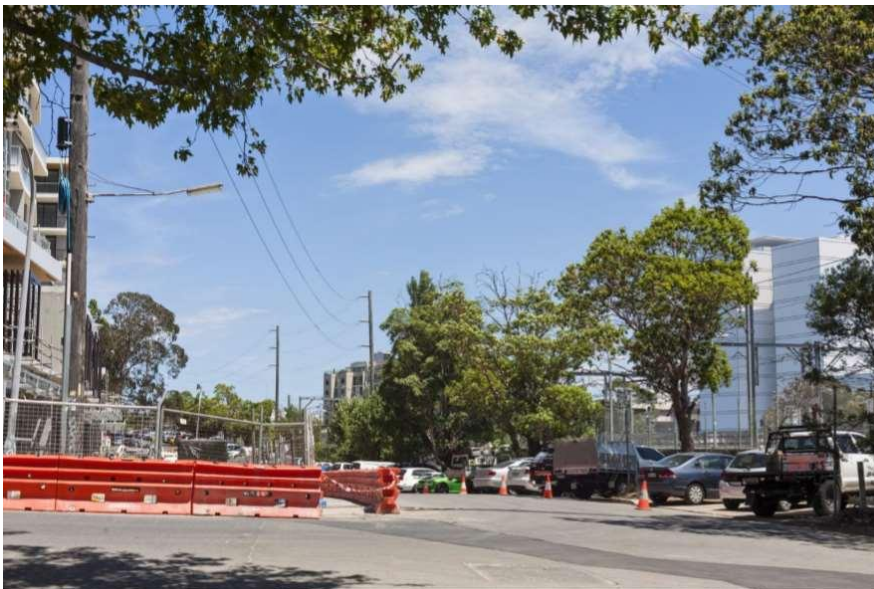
Cambridge Street near the intersection of Chester Street looking south-west (indicative) (Source: Architectural Images)
